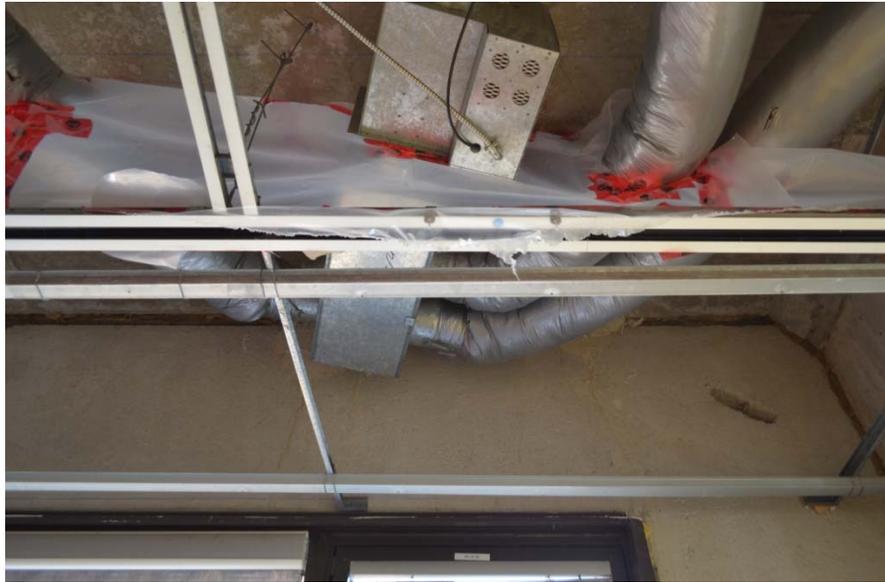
A typical office interior with the ceiling and drywall removed. The ductwork is in proximity to the exterior wall but is not attached.
